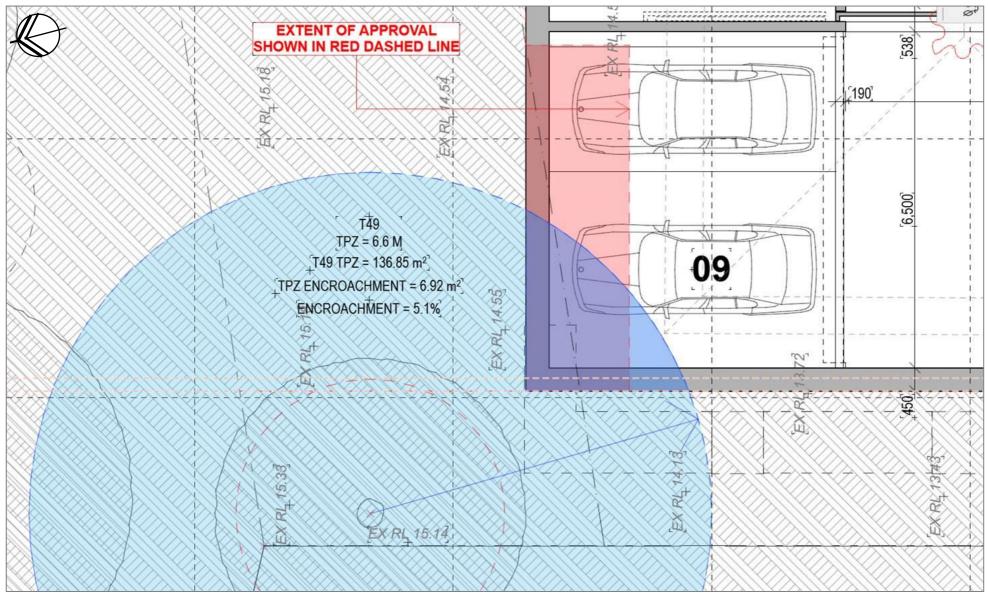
Excerpt of Basement Plan, Dwg no. DA-03, Revision D-P9, dated 12 February 2024, authored by Gartner and Trovato Architects. (NOT TO SCALE).
